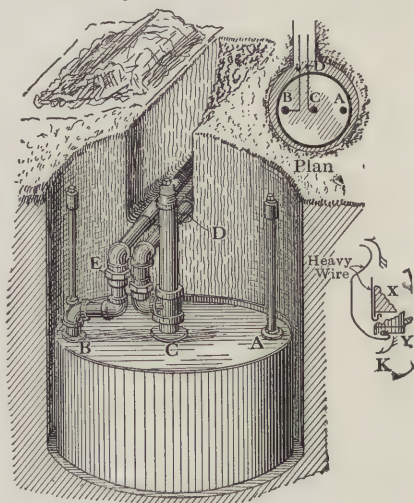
DETAILS OF STORAGE TANK WORK IN GAS MACHINE JOBS
